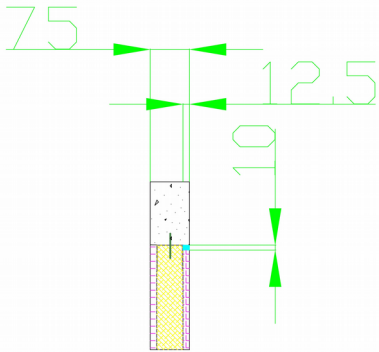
wall gypsum to stone thickness ≥ 75 mm
